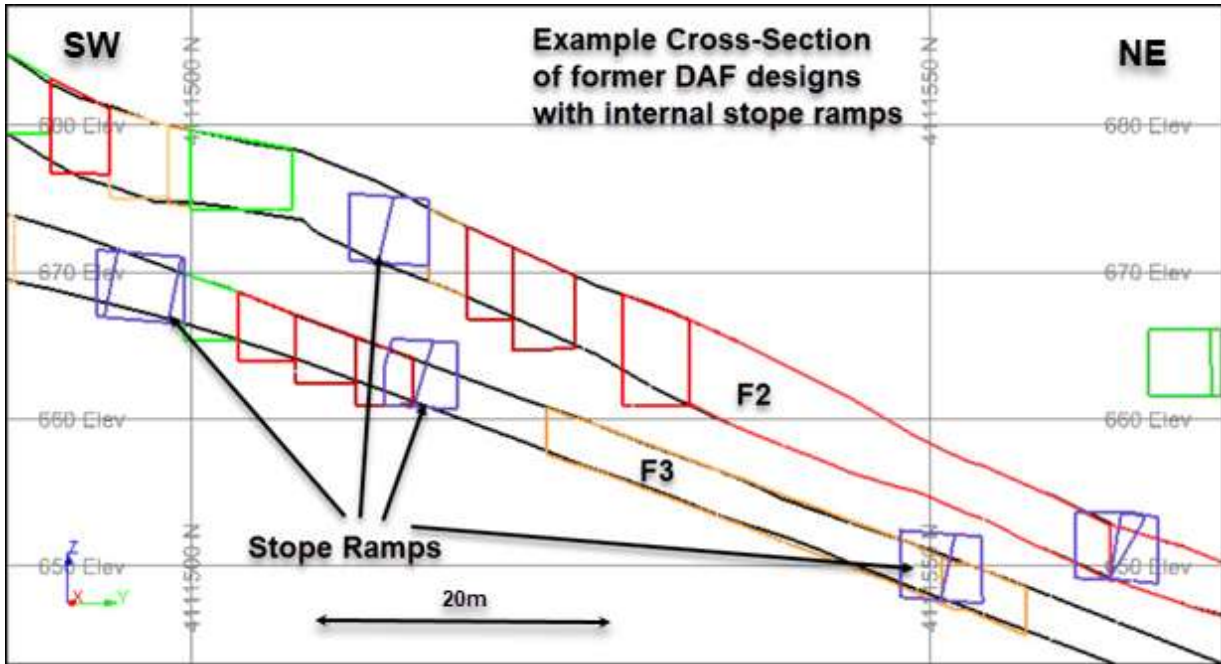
3D View of Former DAF Design with Internal Stope Ramps
